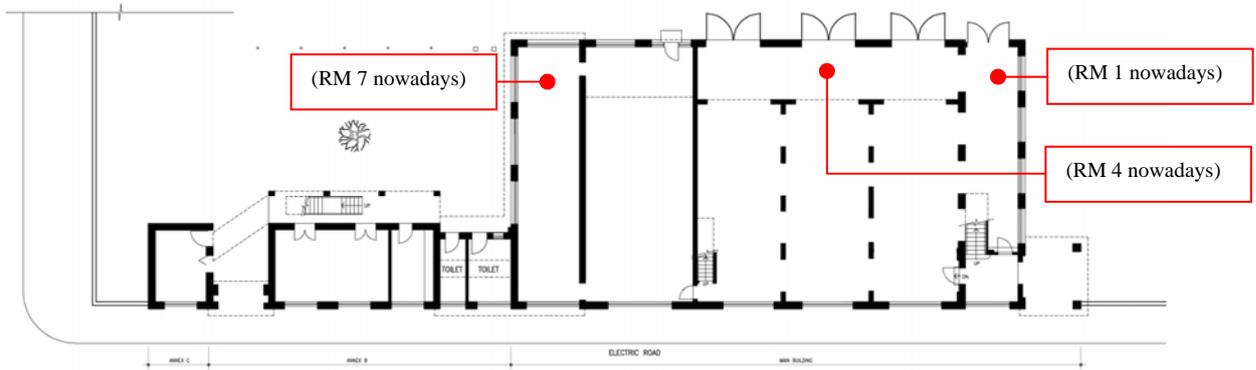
Possible ground floor plan of the former clubhouse at No. 12 Oil Street in 1908.
